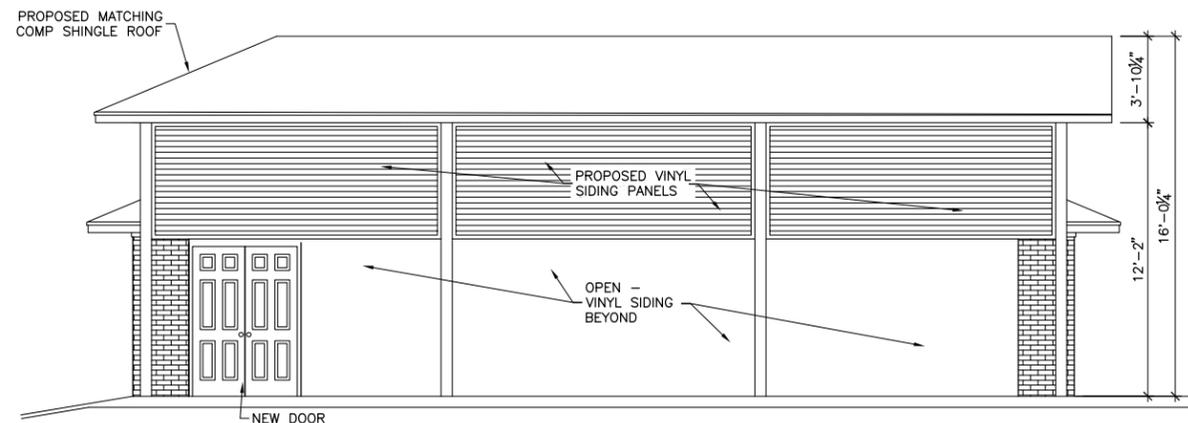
EXHIBIT "A" - CONCEPT PLAN Shop, Garage & Carport Expansion
